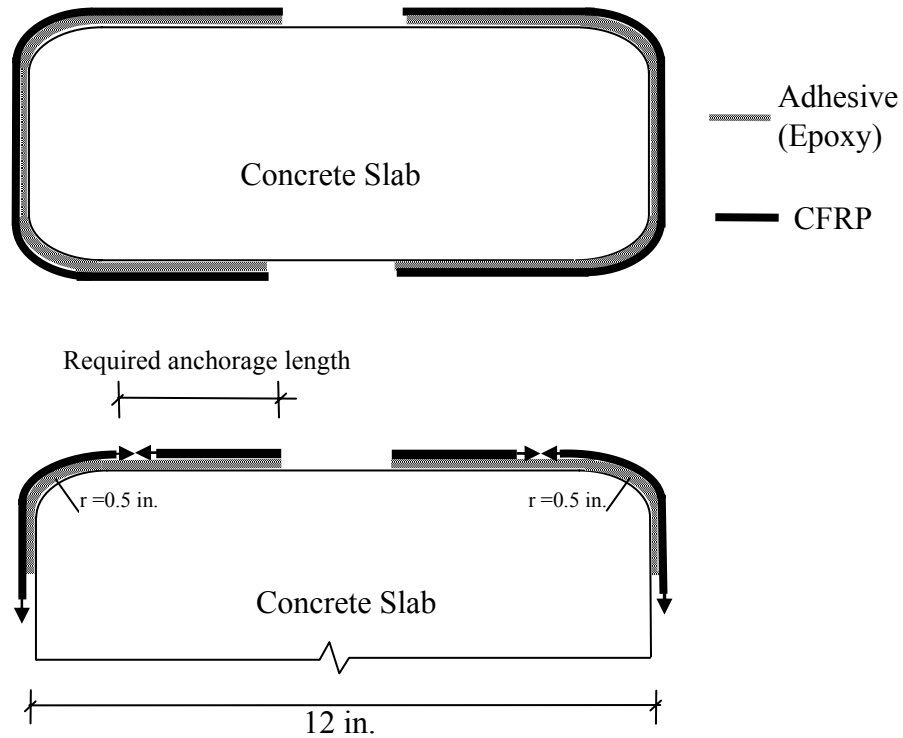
“C-Shape” CFRP Strips Used as Shear Reinforcement
